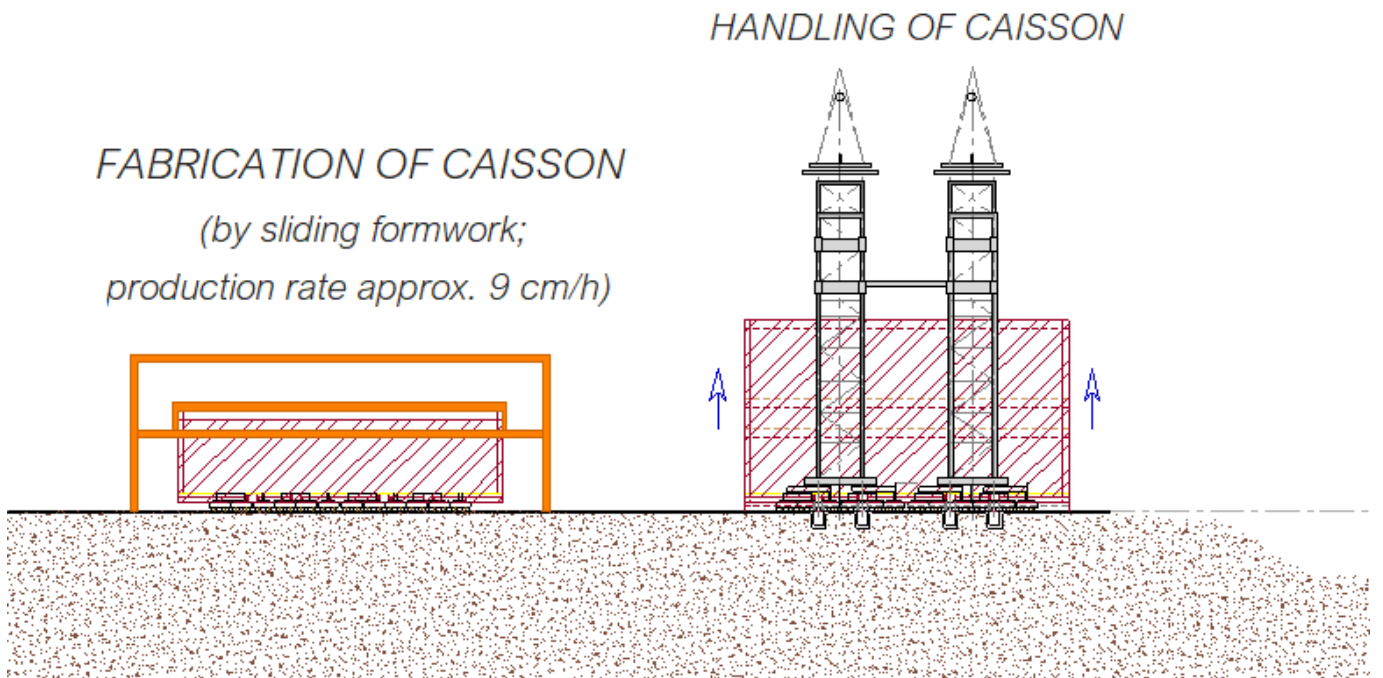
Visualization of the Fabrication (left) and Handling of the caisson – the caisson on the launching way by DEVE heavy gantry crane (right)
